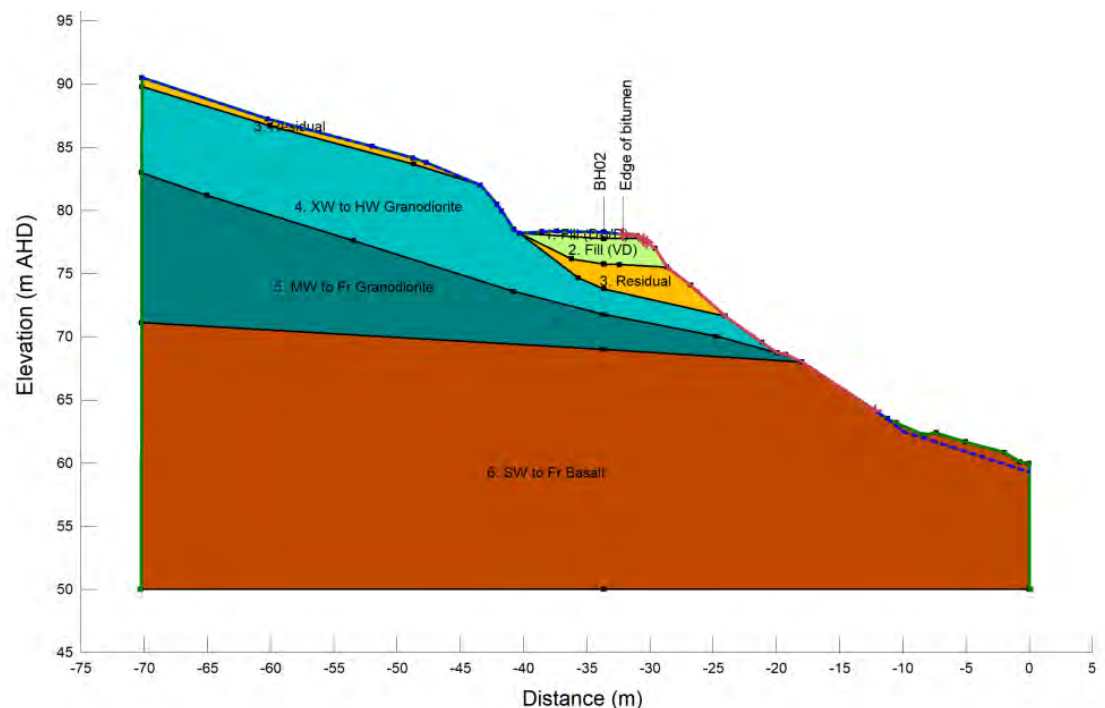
Section B-B cross section geotechnical model, based on subsurface conditions encountered in BH02
